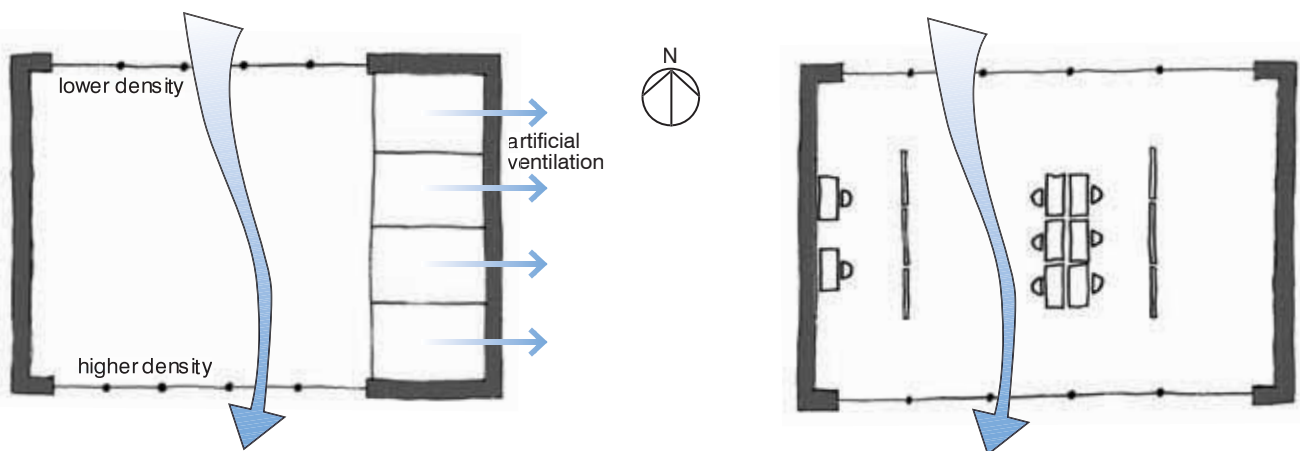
+ 20. Plan partitions so as to not block flow of air through the building.
